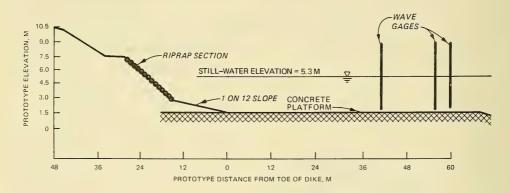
Profile view of 1-on-3, riprap-protected slope and offshore wave gages
